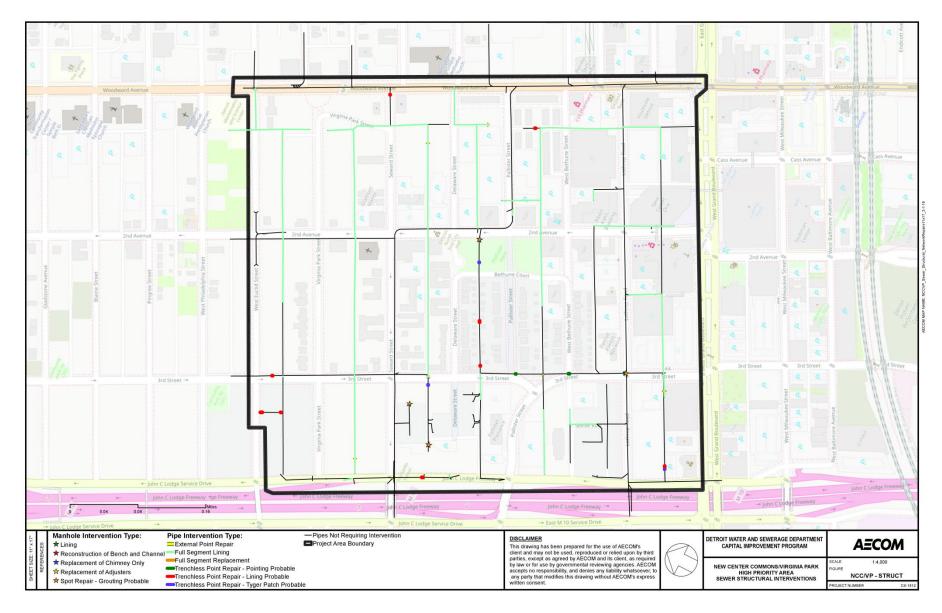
New Common Center/Virginia Park Sewer Structural Repairs
